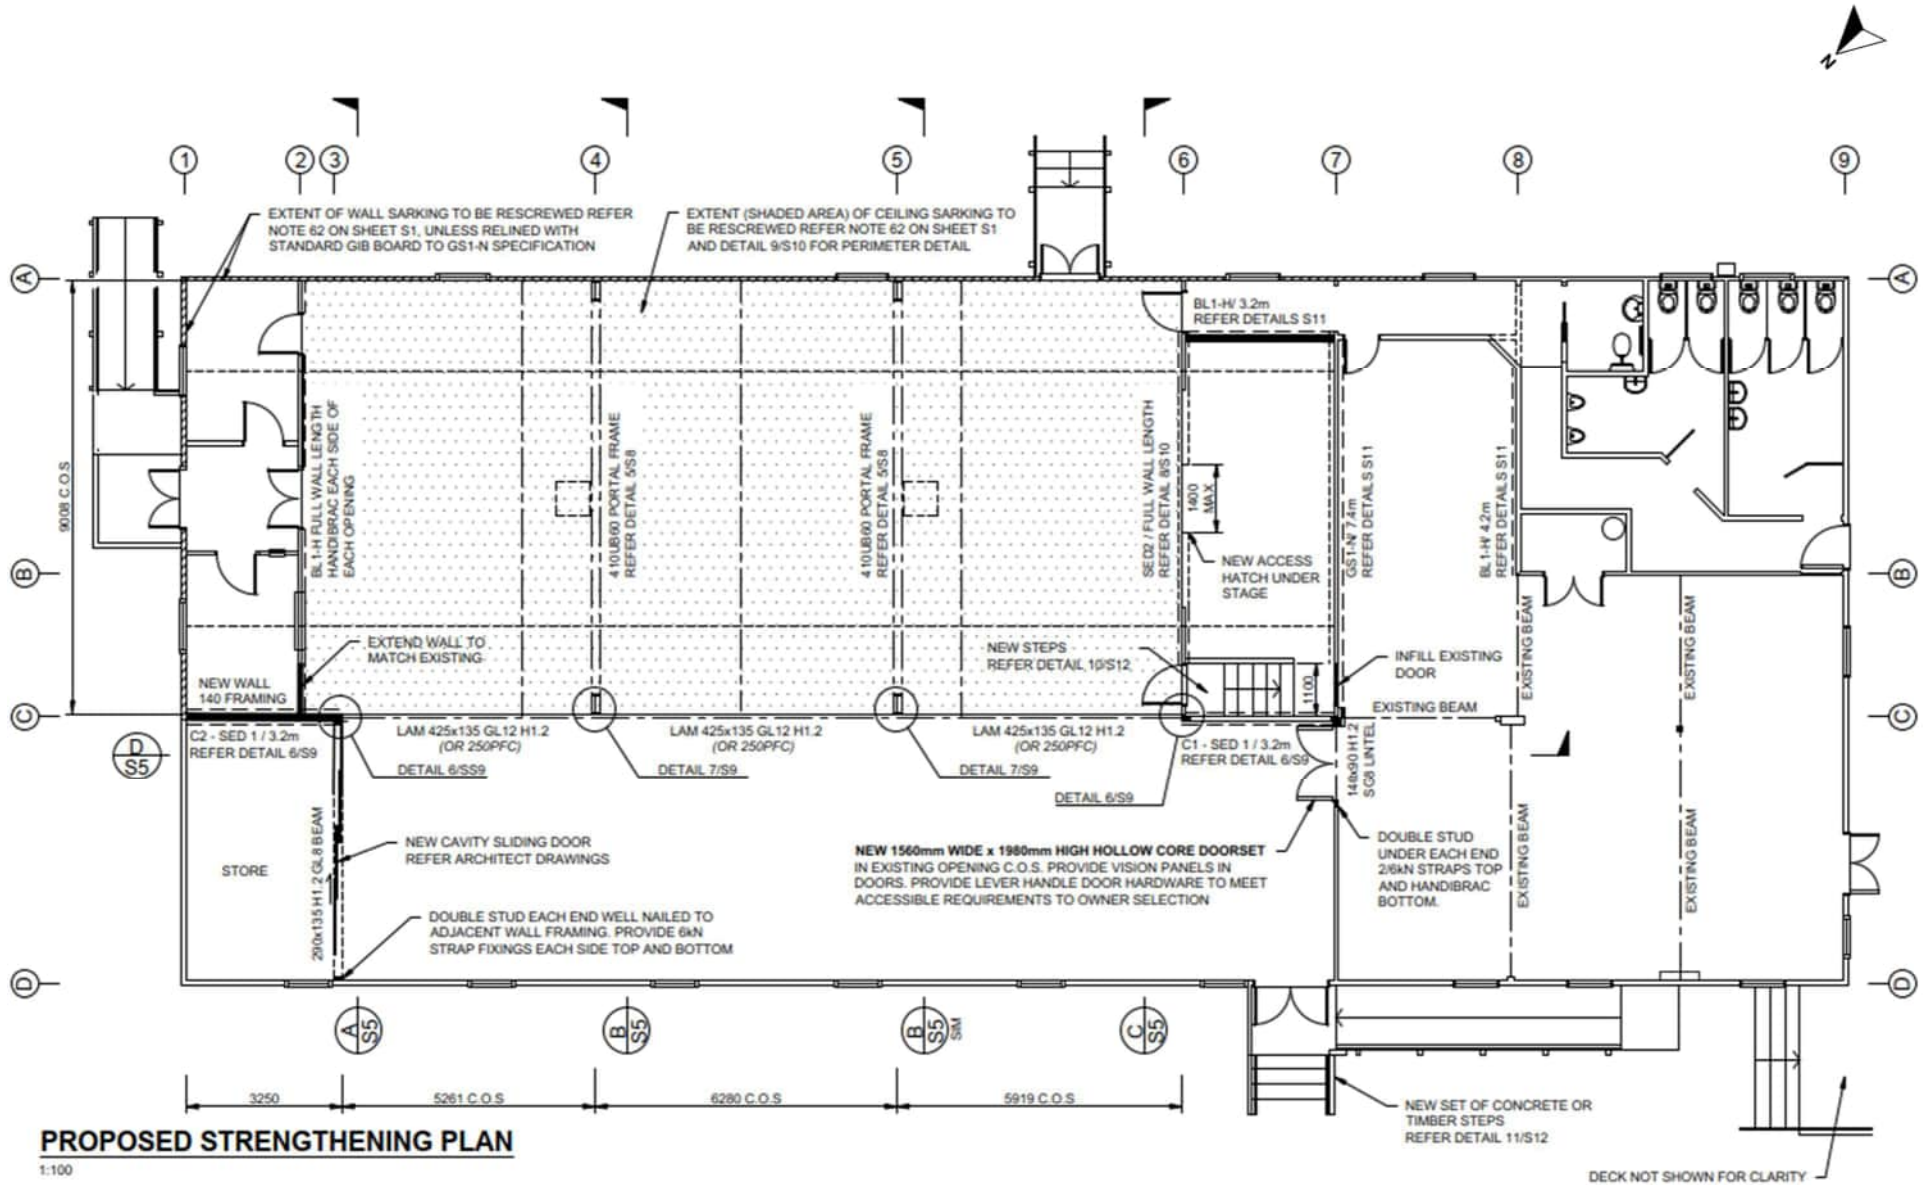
Proposed floor plan of the Te Horo Hall (NTS). Source: Seajay Consultants.
